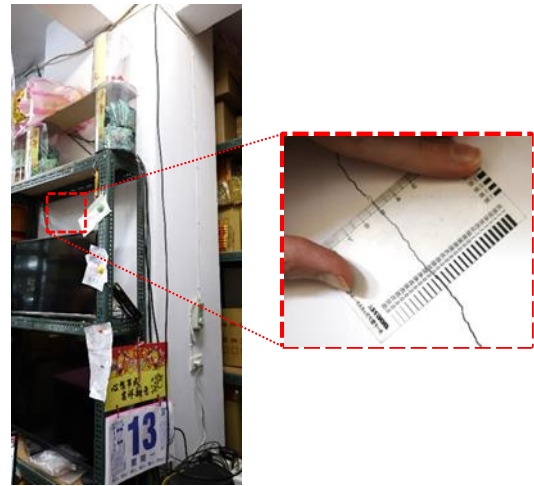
Boundary column of added shear wall with RC jacketing and 0.5-mm wide shear cracks in Building E36.
